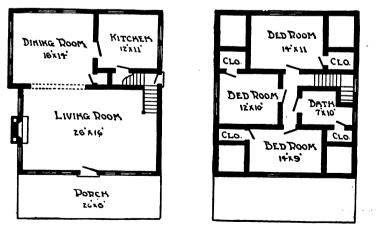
COMMUNITY I. PLAN OF STORY AND A HALF MILL-CUT HOUSE OF 6 ROOMS, BATH, AND CELLAR
